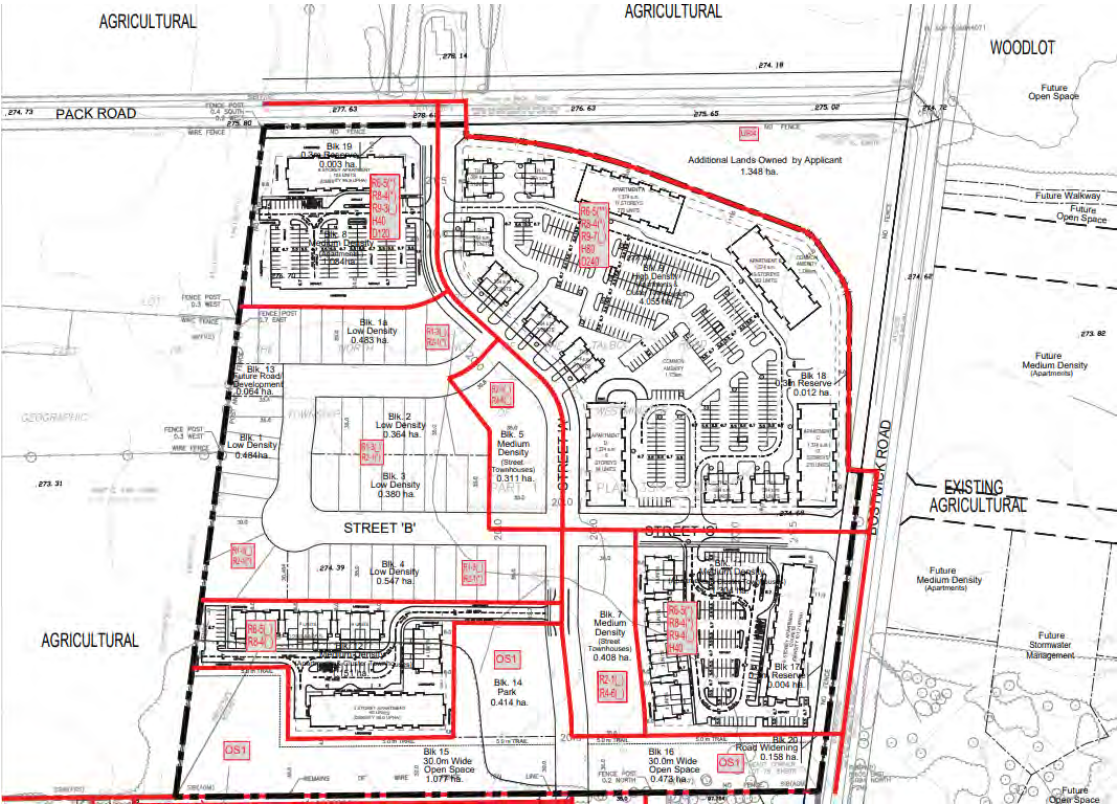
Proposed Site Plan (Source: MHBC, 2024).
